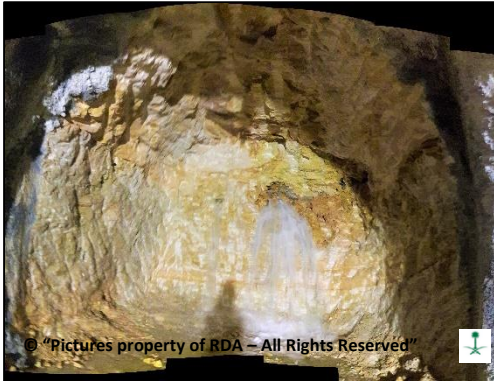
Water flowing from a cavity intercepted during the excavation of a tunnel section.
